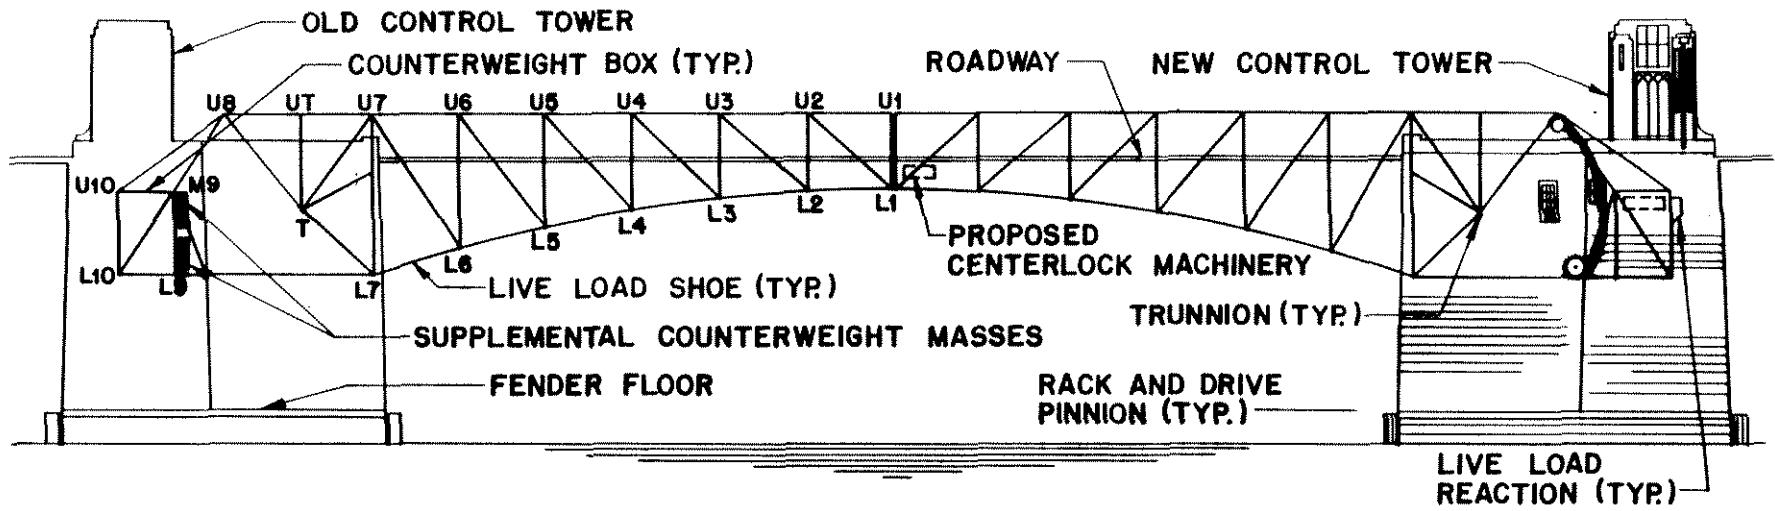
ELEVATION OF UNIVERSITY BRIDGE
